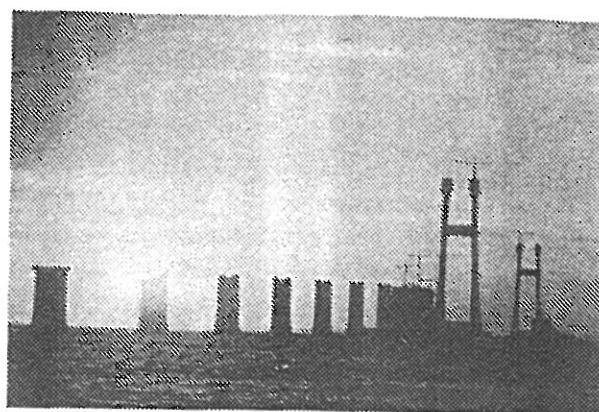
The sun setting behind the East Bridge pylons in early 1995
